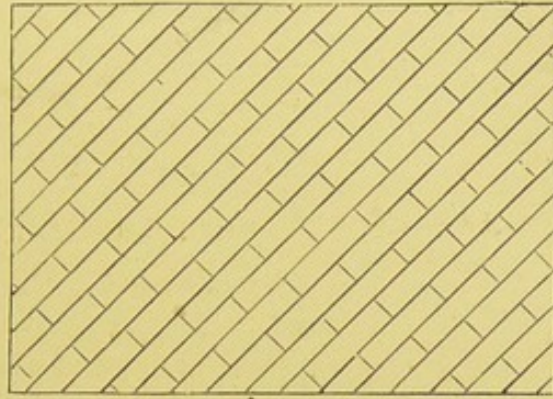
FLOOR WITH ASPHALTED JOINTS.
